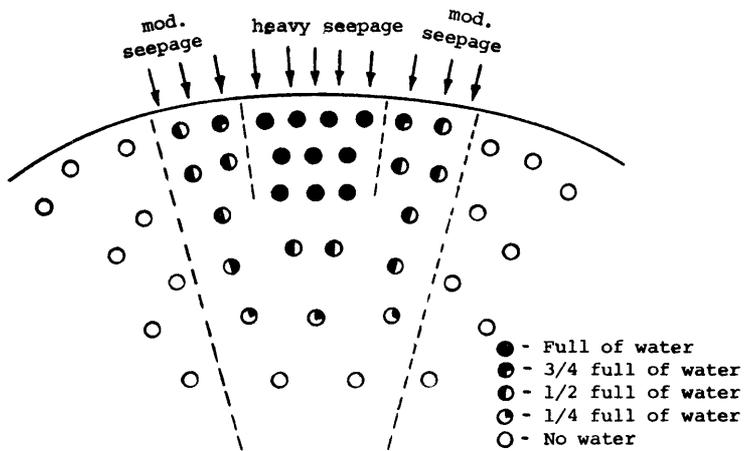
Blasting plan showing water in blastholes. Such a plan clearly indicates where slope drainage is required.
